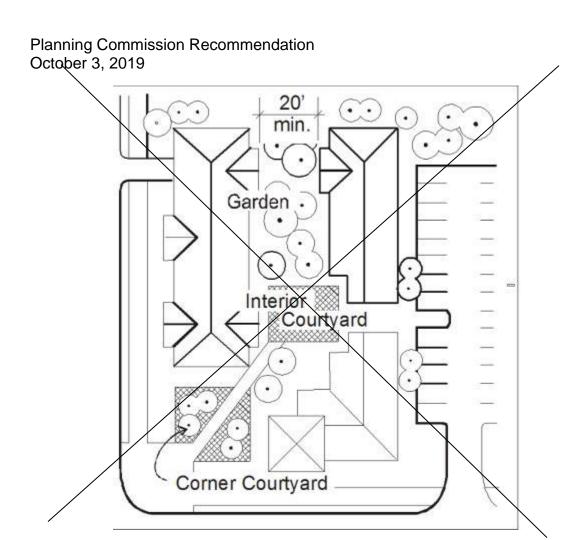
(A): Usable outdoor open space can be created by careful siting buildings and appropriate landscape design.
